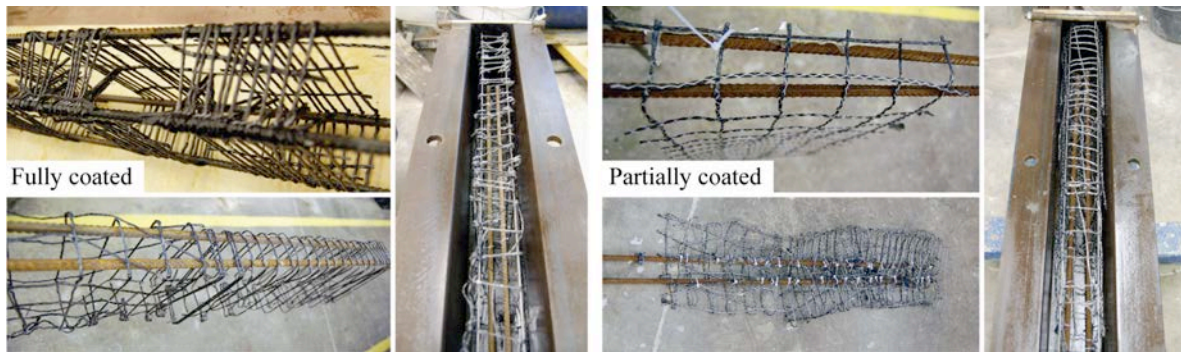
CFRP grid fabrication for Beam 1 (left) and Beam 2 (right).
